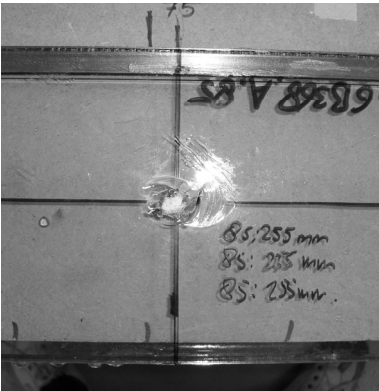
Frontal view of side impact in 3re.GB368.A specimen. Only a dent appears.
